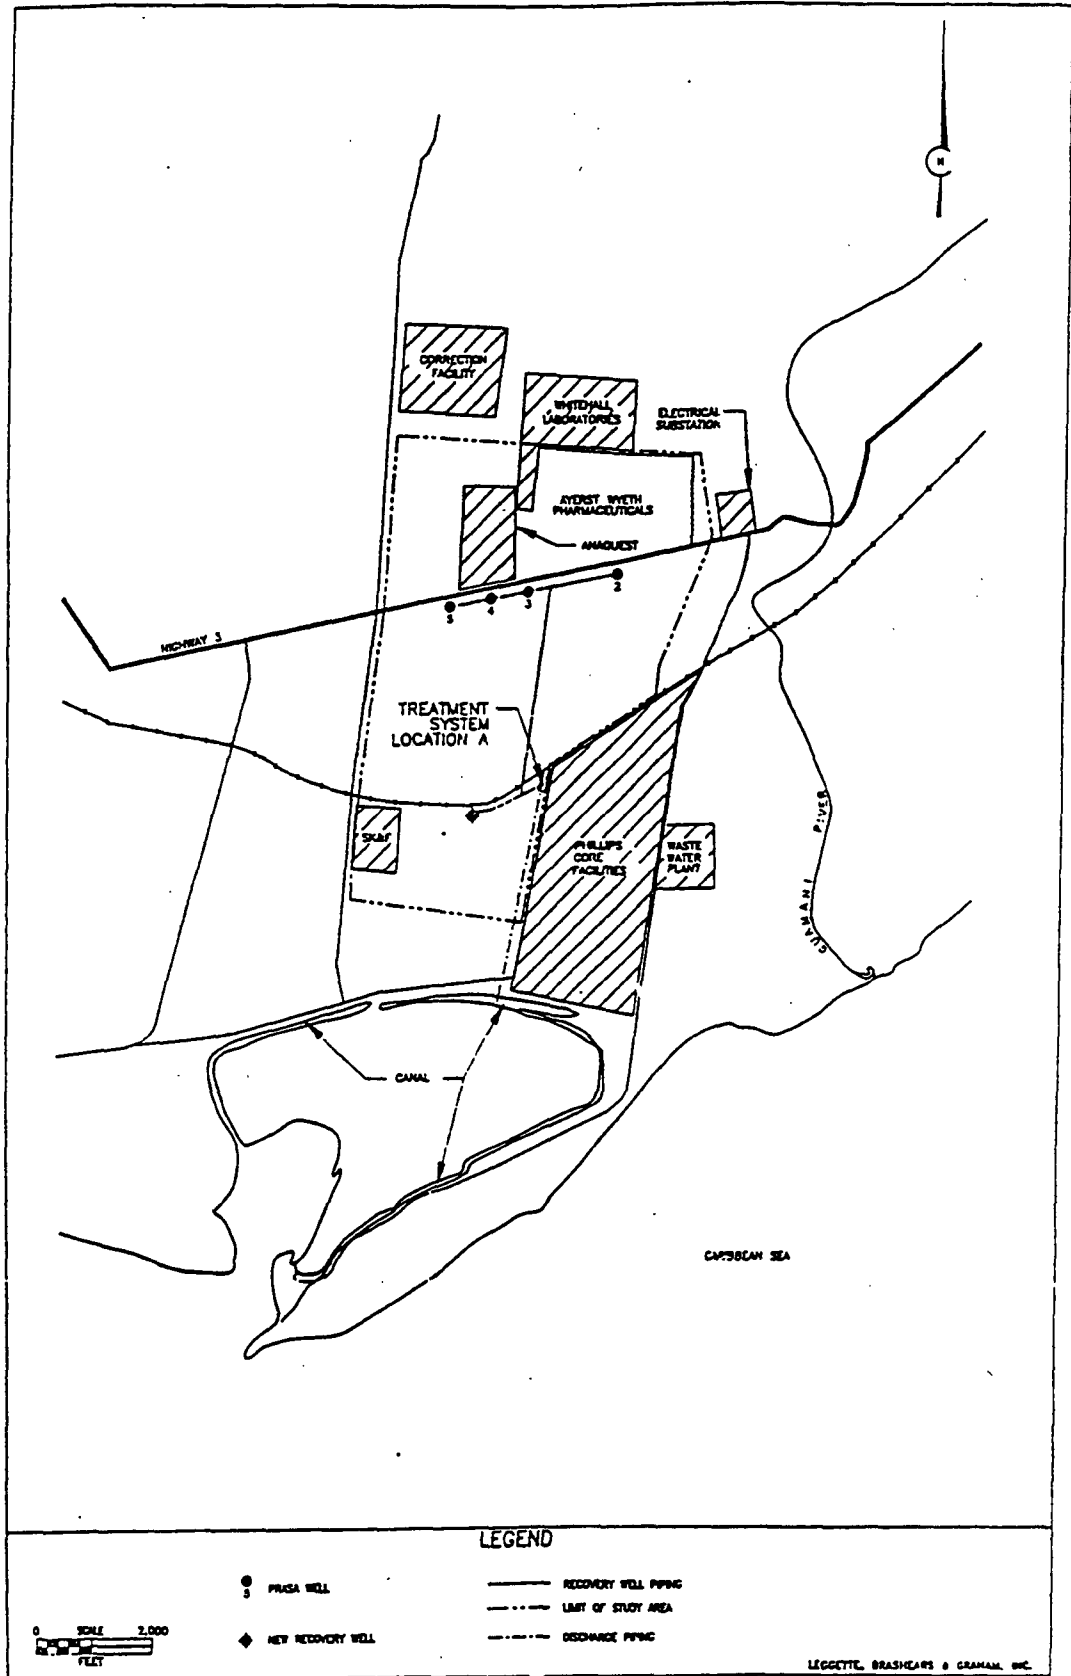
LAYOUT OF ALTERNATIVE 3-1
